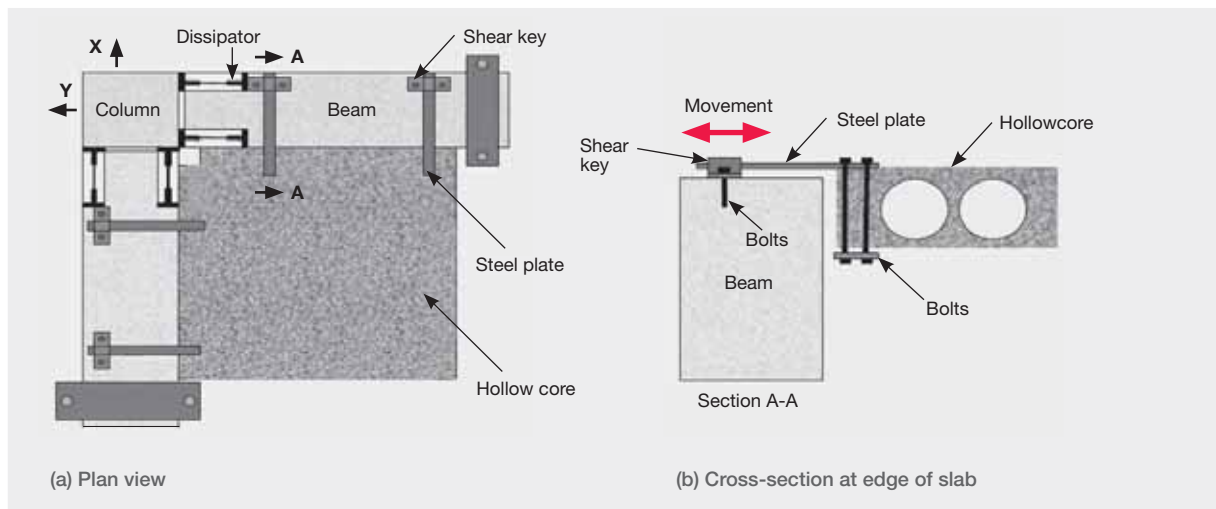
Beam-column joint with articulated floor unit at a corner of a reinforced concrete frame building (source: Amaris et al, 2007¹²)
